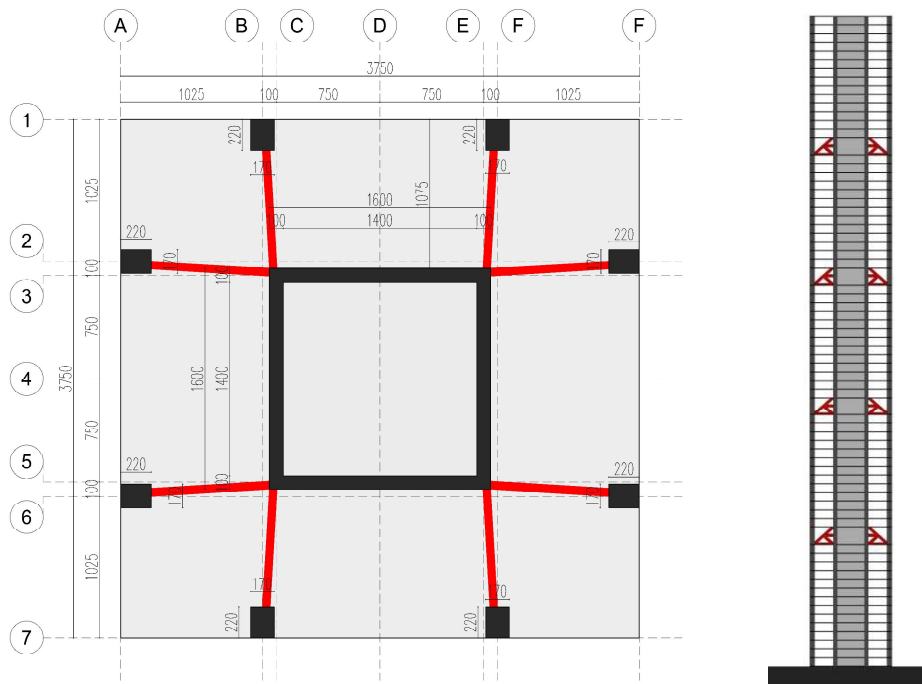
Typical floor plan and elevation of model "OF_OPT_3e" with the demonstration of outriggers
